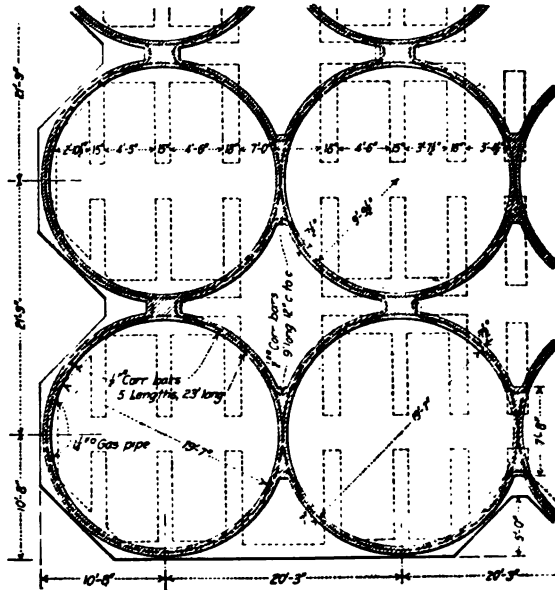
Concrete bins of Great Northern Ry's grain elevator, West Superior, Wis.
